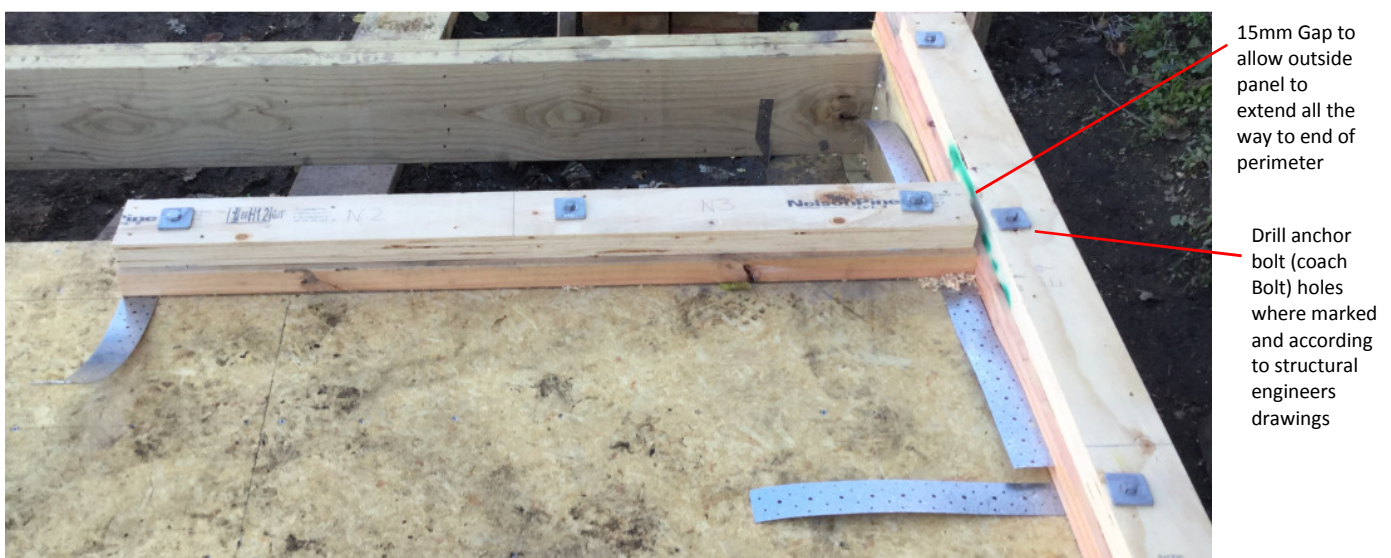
Anchoring bottom-plate and soleplate to foundation.
